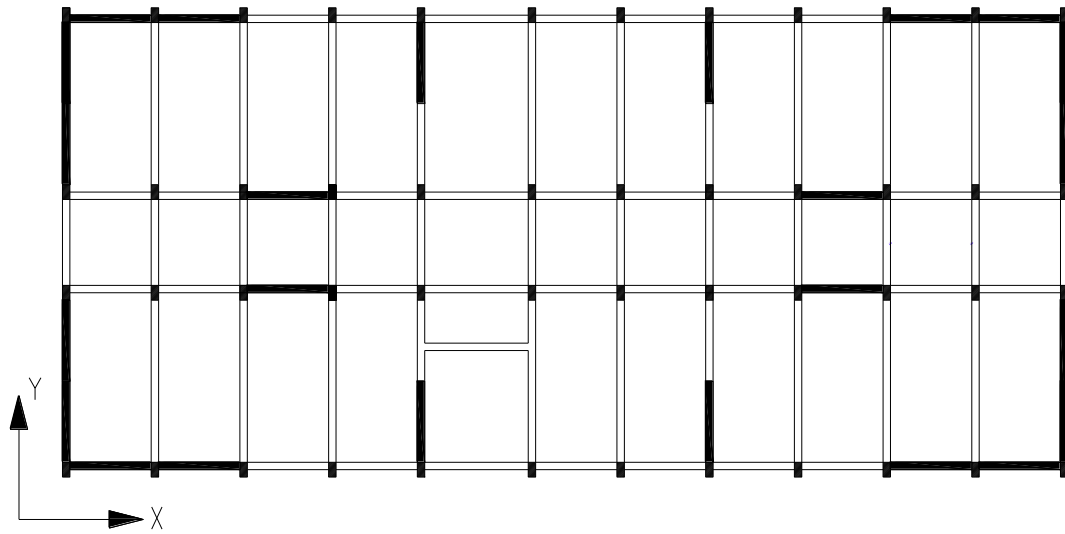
Plan View of the Designed Building with 1.5%-1.5% Shear Wall Ratio
